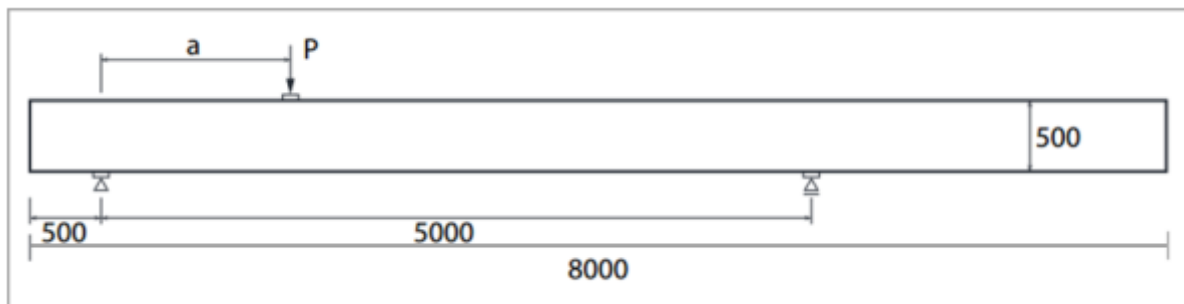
17 Geometry, support and loading conditions for specimens from experiment 2(Unit: mm) [5]
